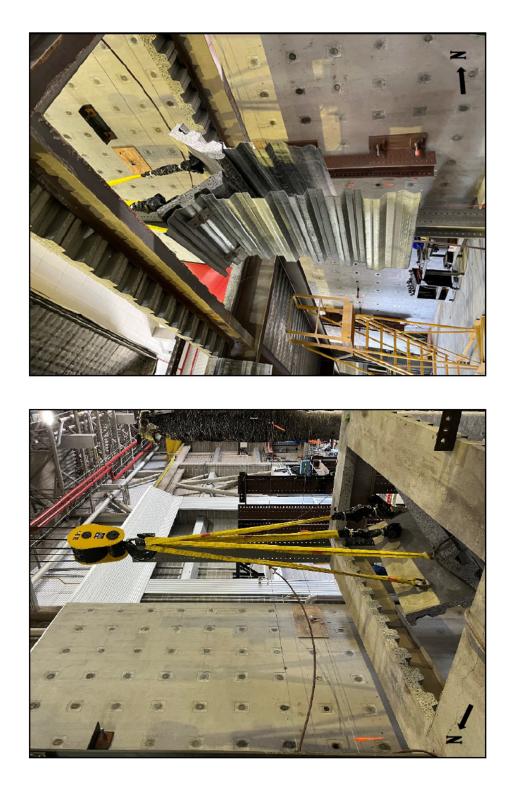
Two large pieces of Slab 4 were suspended by the rigging after fracture. Viewed from a) the surrounding floor looking east and b) the strong floor looking up and west.
